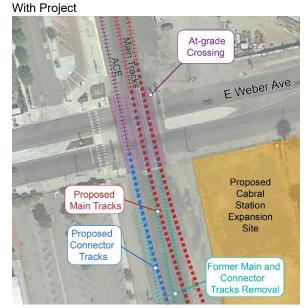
Existing and Proposed Track Configuration (East Weber Avenue to South of East Church Street) – Sheet 1 of 3
